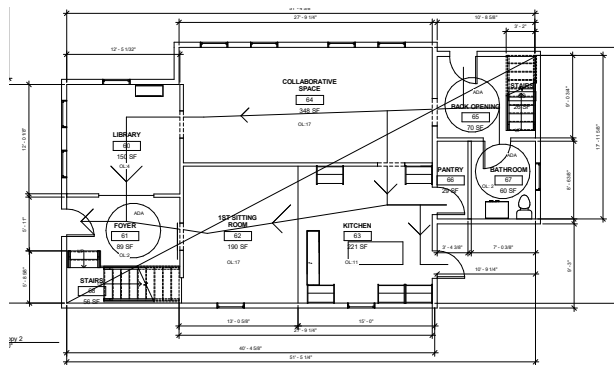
Changes between Carmen's first-floor interim presentation plan and her life safety plan.
